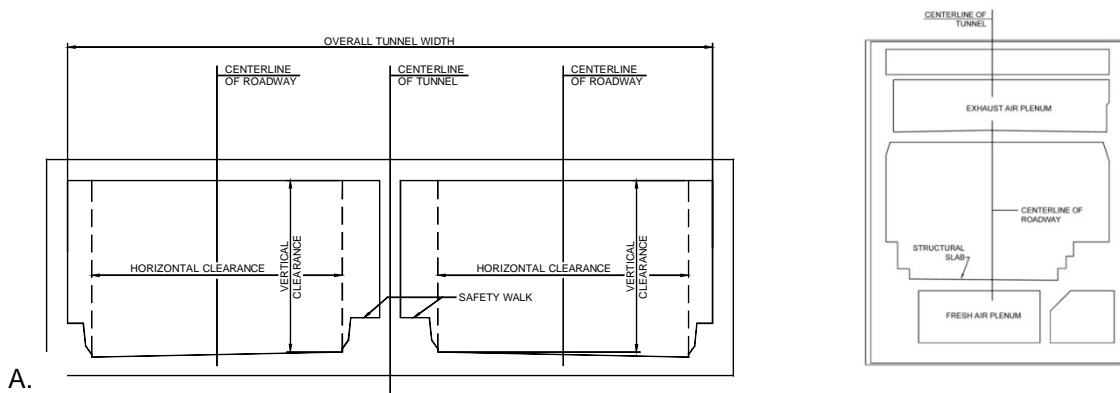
A) Rectangular shaped tunnels. Left shows twin tunnels each with two lanes and one safety walk. The center wall may be solid or built with consecutive columns. B) Right is a box tunnel shown with two traffic lanes and a single safety walk. Invert may be constructed of solid concrete or a structural slab that provides void space for ventilation and/or drainage.
